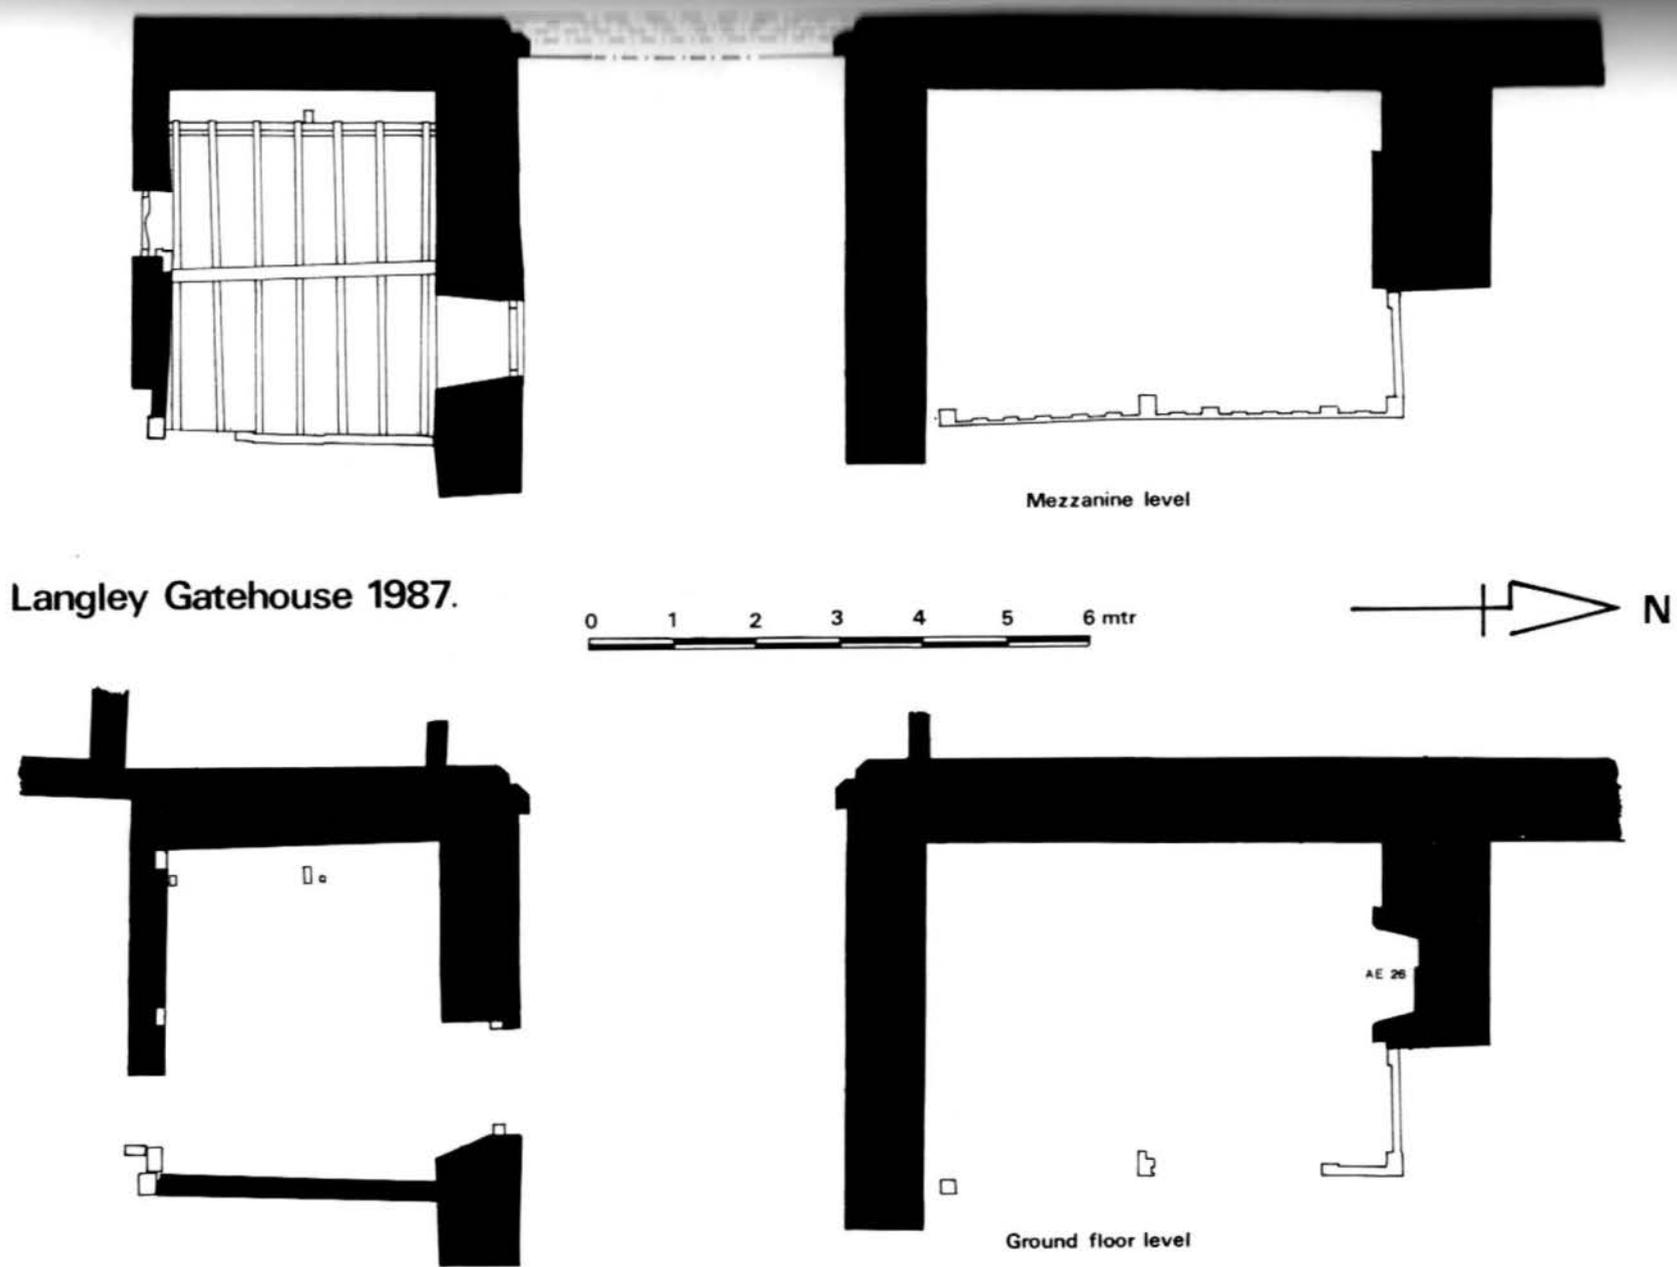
Plan: Ground Floor and Mezzanine Level.
